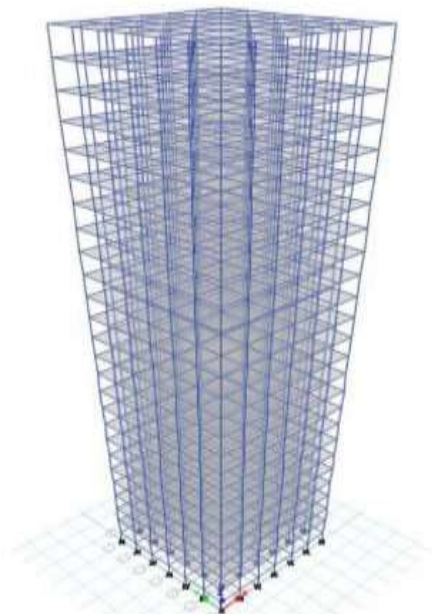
Sectional Elevation Of Building Model 1 (Without Outrigger)
